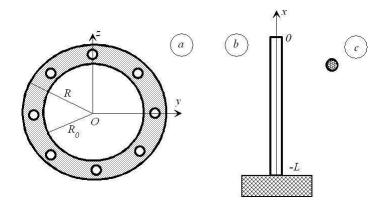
(a) The cross-section of beam, (b) the pile, (c) the cross-section of pile.
